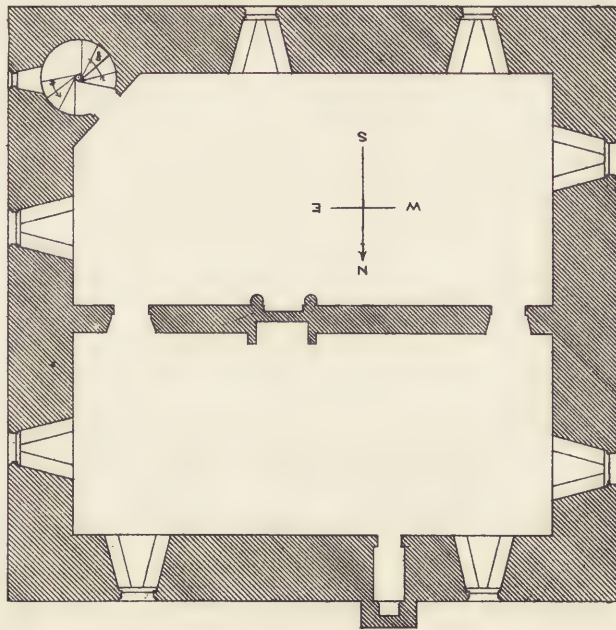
, PLAN OF FIRST FLOOR OF KEEP.
